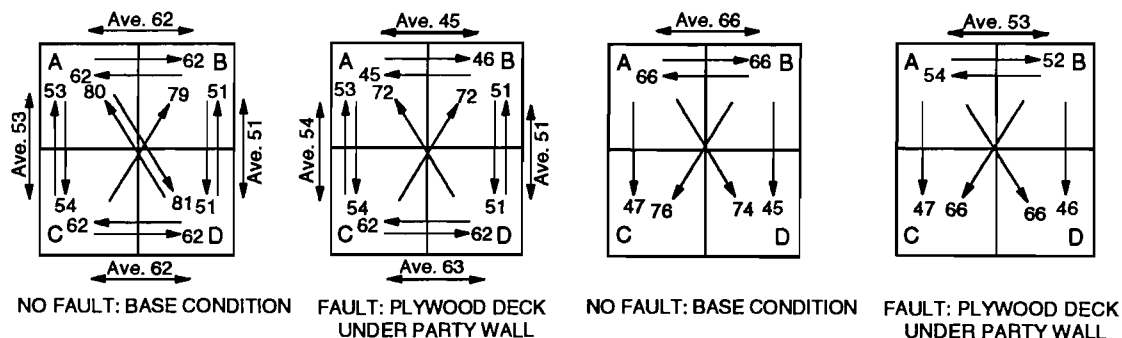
Measured airborne sound insulation class (FSTC: E336 test) between rooms A, B, C and D with and without the plywood decking continued under the party wall.
